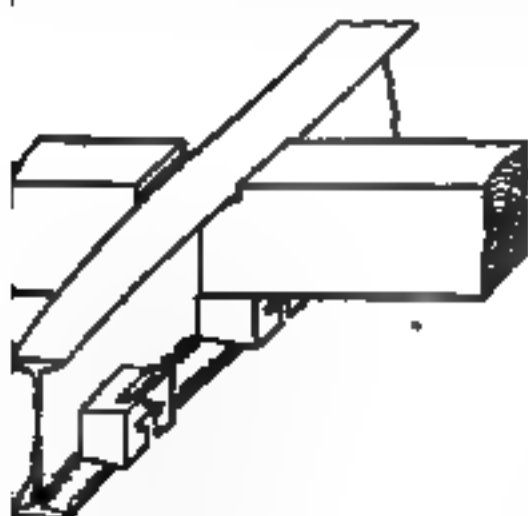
Duplex I-beam Box Hanger. Joists Raised More than Four Inches
